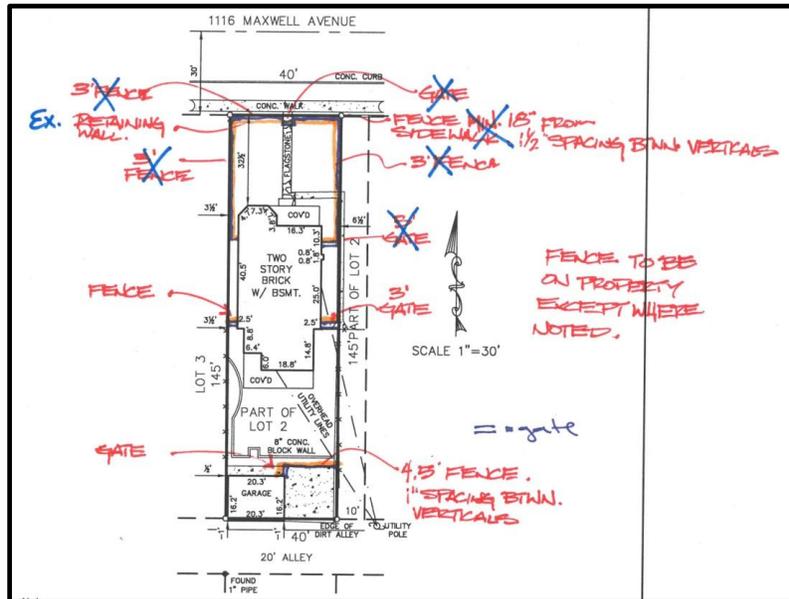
1116 Maxwell Ave. Approved site plan, February, 2014
